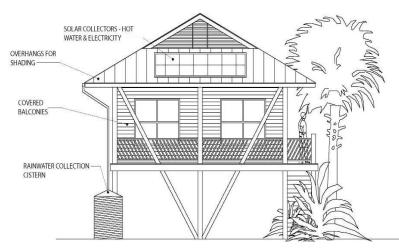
Alternative B, Conceptual Cottage Design under Alternative B, Flamingo Rebuilt
